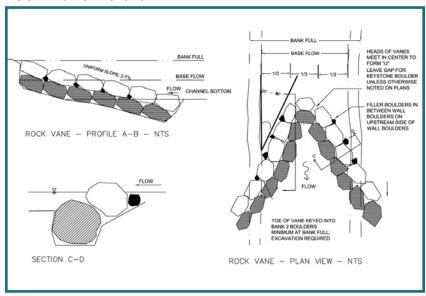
Rock vane plan and cross-sections, not to scale.
